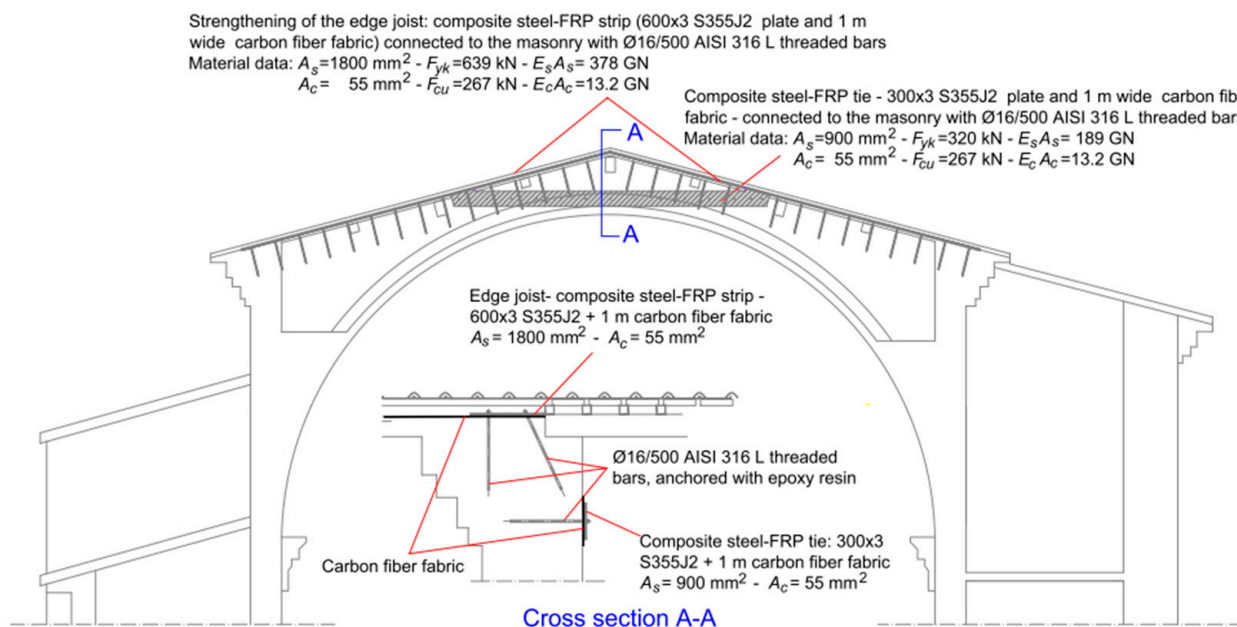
Main façade: strengthening of the edge joist at the top of the gable: type A intervention.
